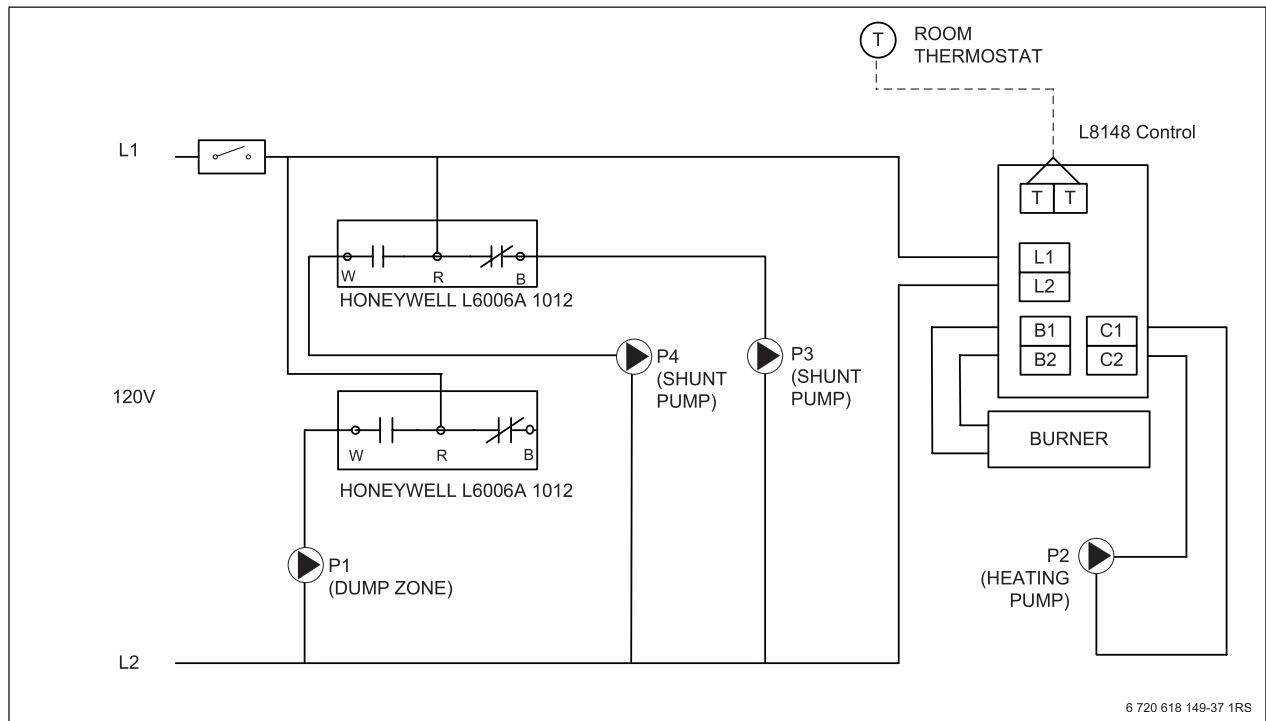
Wood coal boiler with gas/oil boiler (example, connection schemes)
